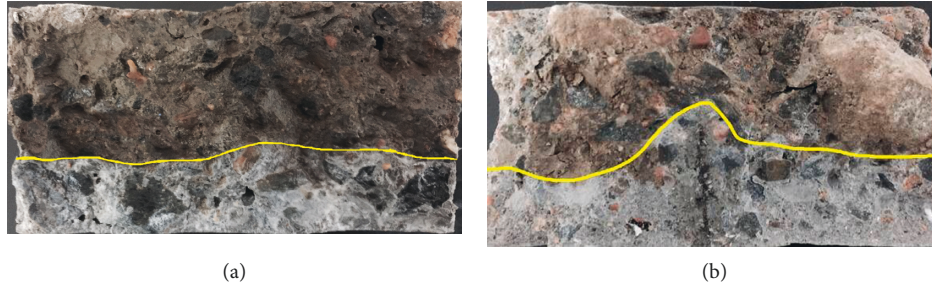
Chloride penetration area in the concrete specimens. (a) Uncracked concrete specimen. (b) Concrete specimen with 1 crack.
